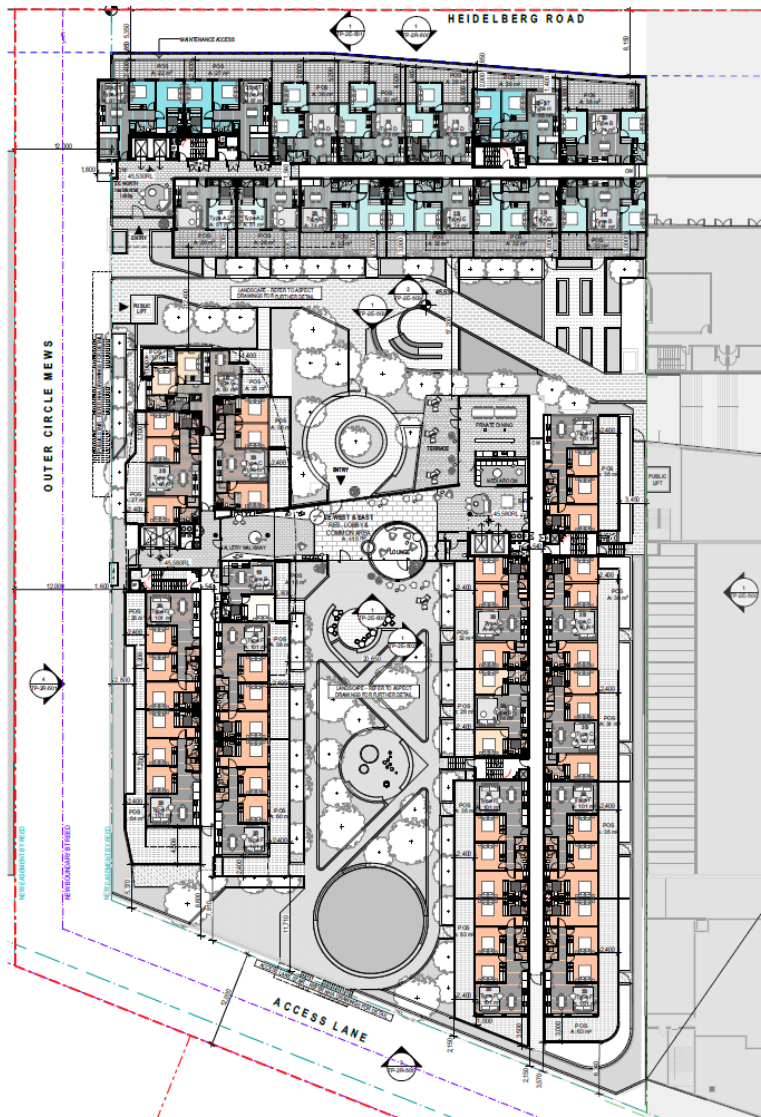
Level 3 plan – The Urban Anchor (Heidelberg Road), The Living Matrix (Outer Circle Mews) and The Sculptural Building (orientated internal to the site).
